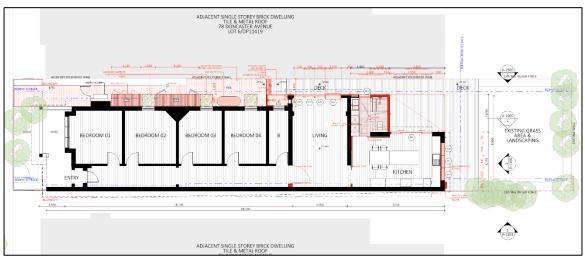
Extract of proposed Ground Floor Plan (Source: B Studio).
